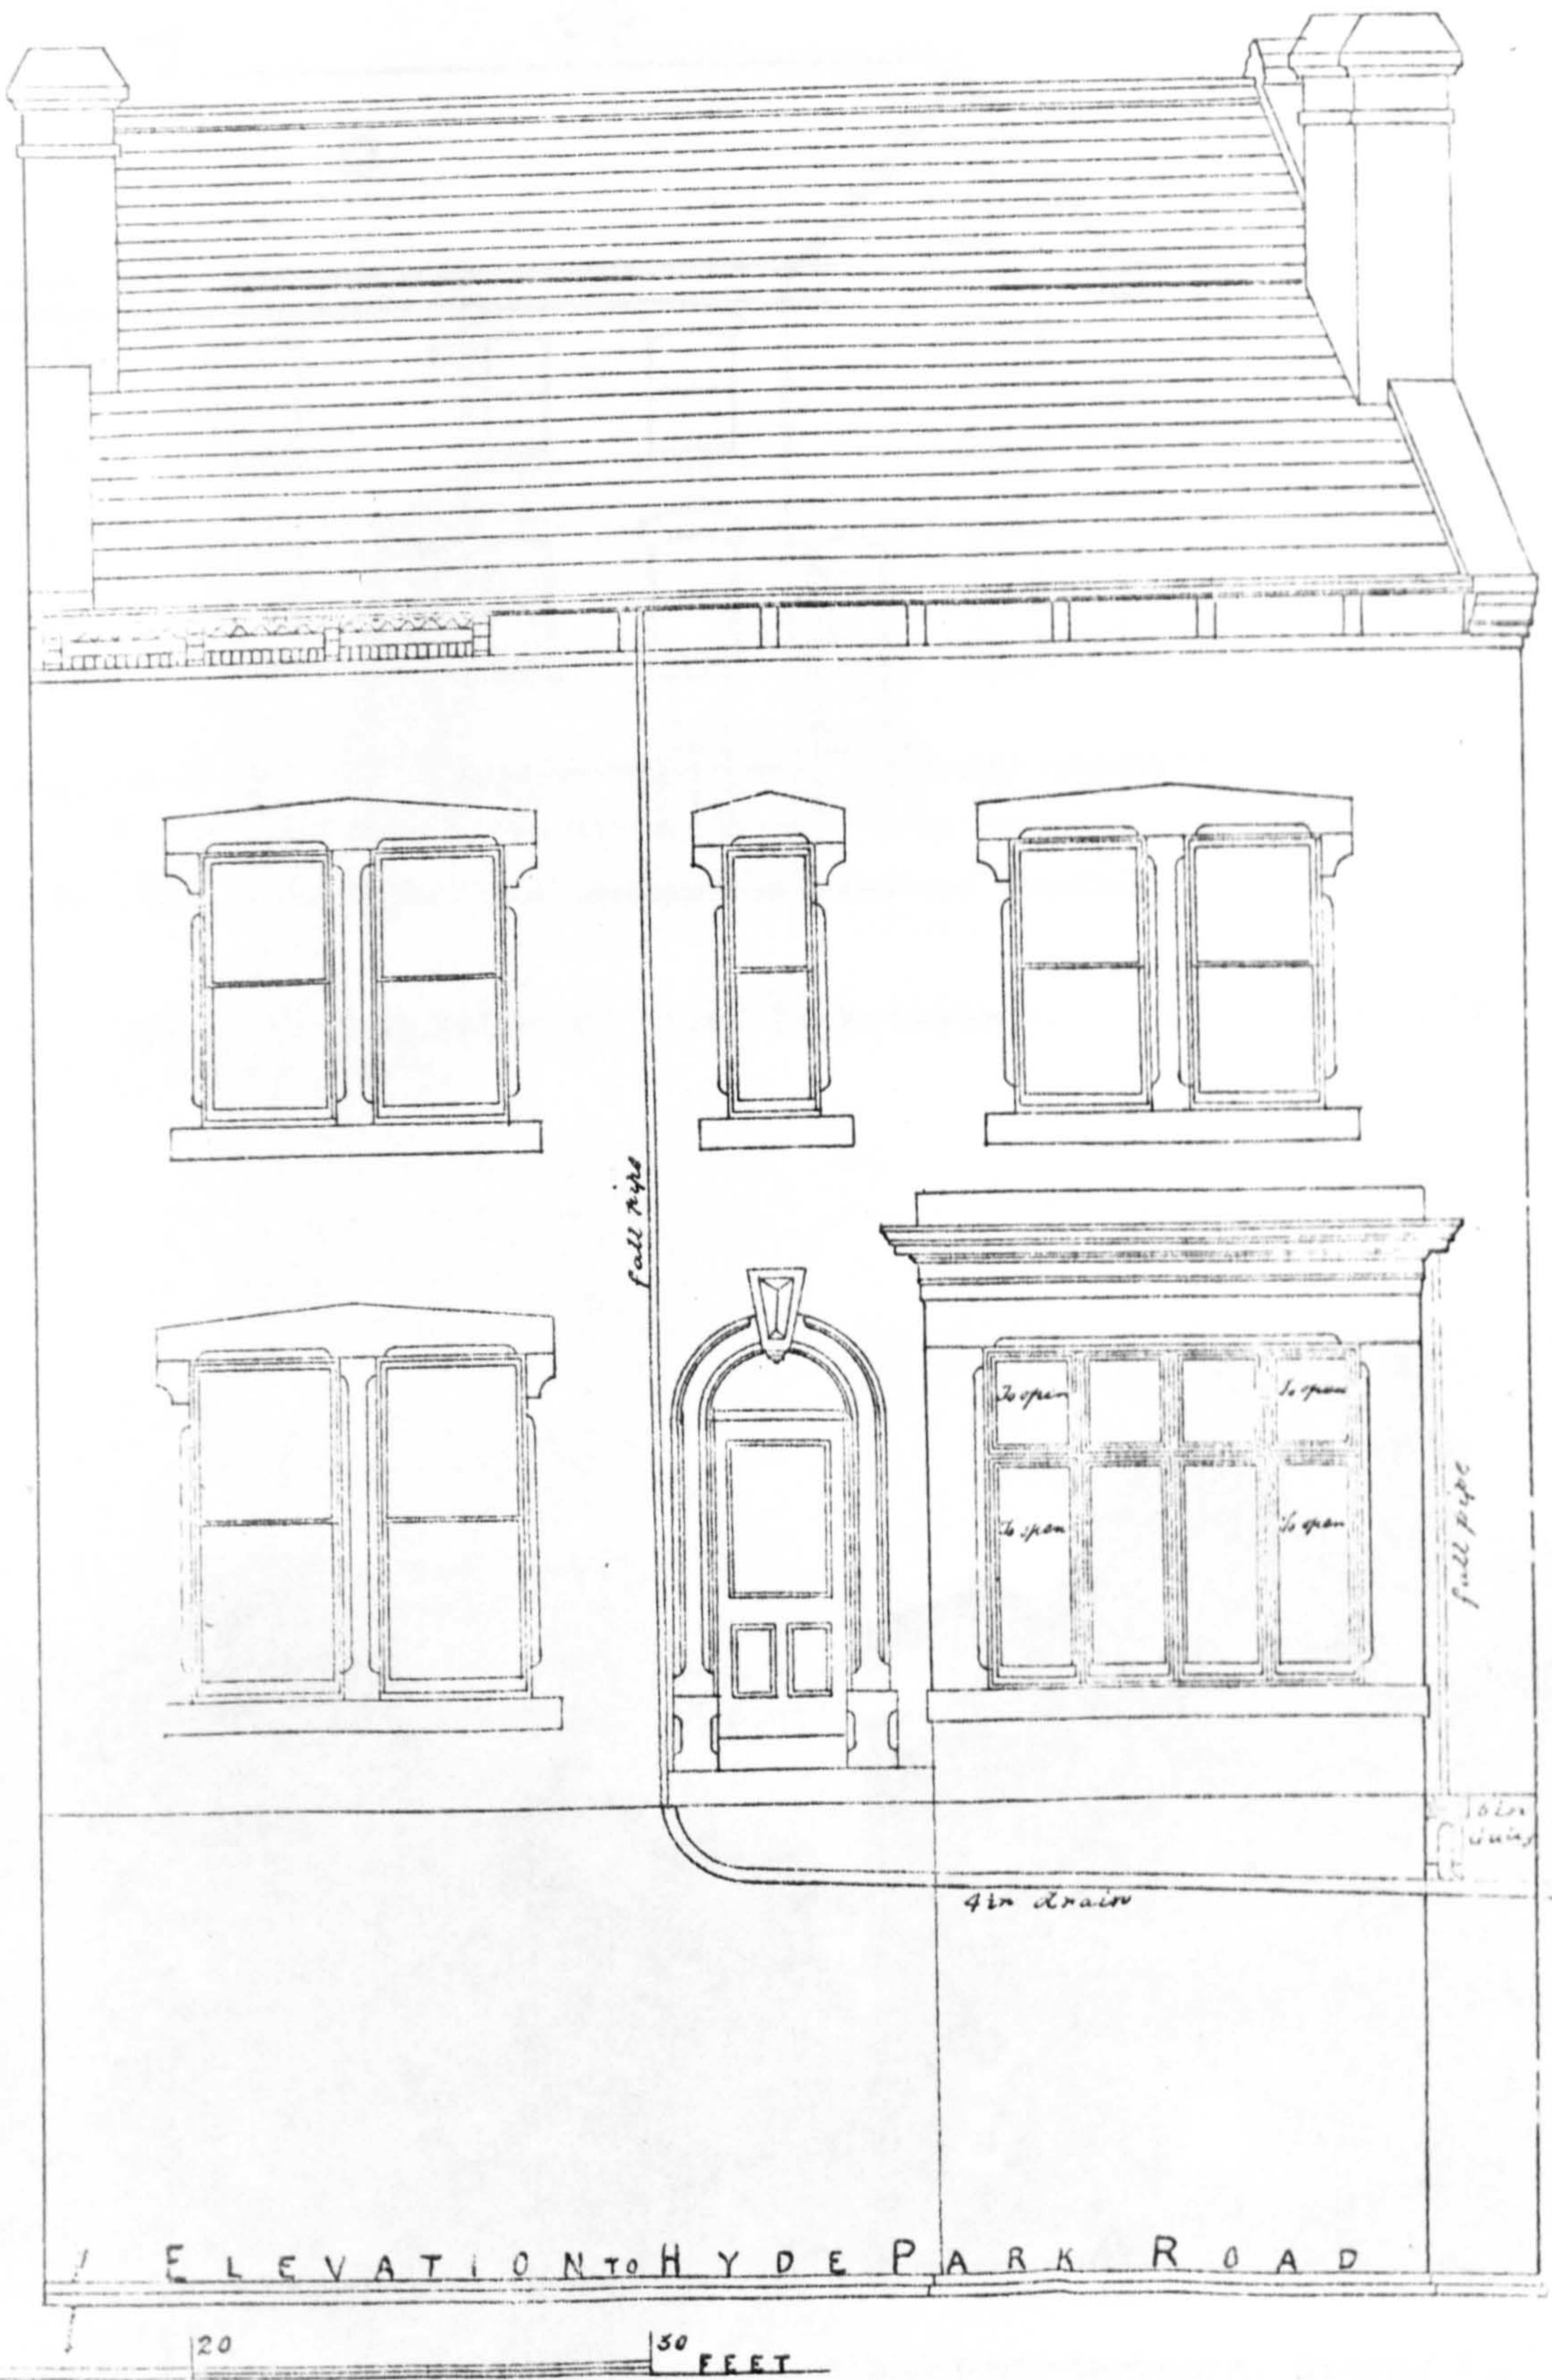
Deposited elevation of end terrace house, Hyde Park Road (J. Simpson 1888).
